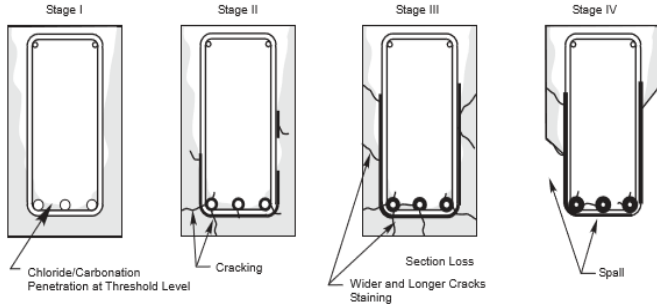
Four stages of corrosion deterioration in RC bridge beams [3]
